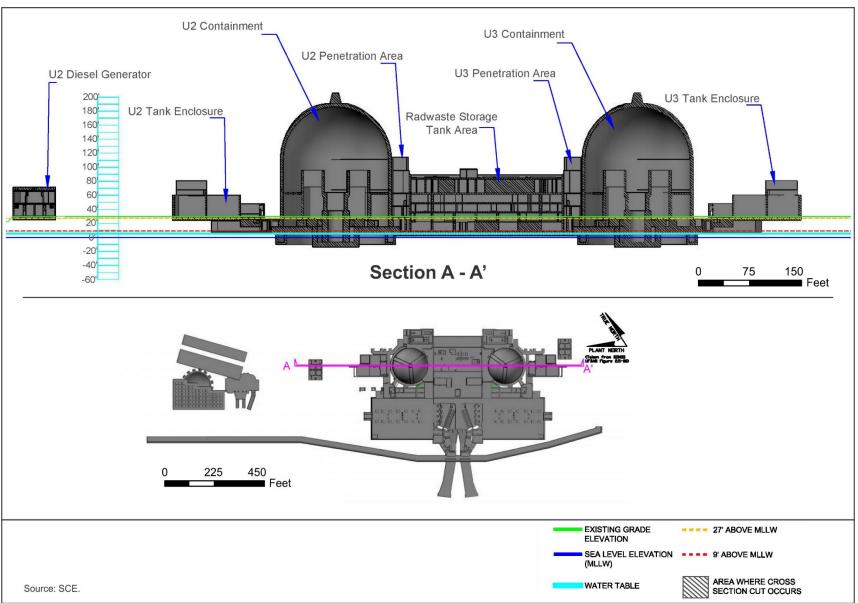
SONGS Units 2 and 3 Cross Section (North to South)
